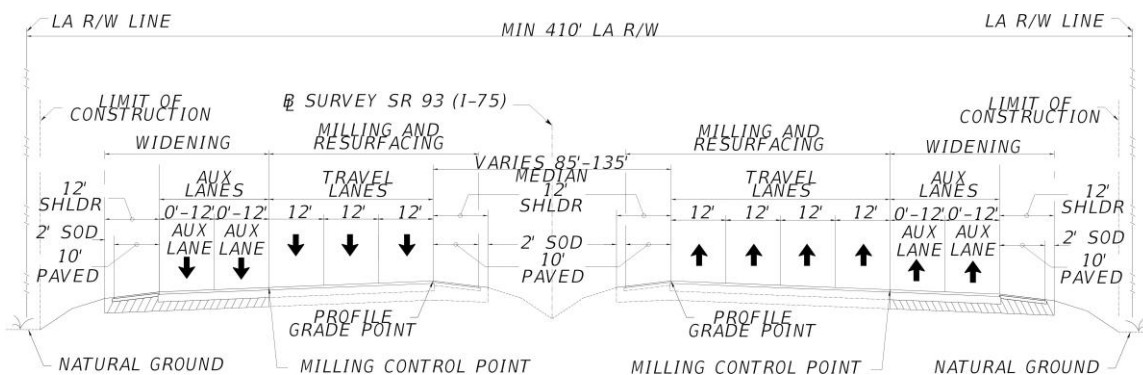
Preferred Alternative I-75 Typical Section
